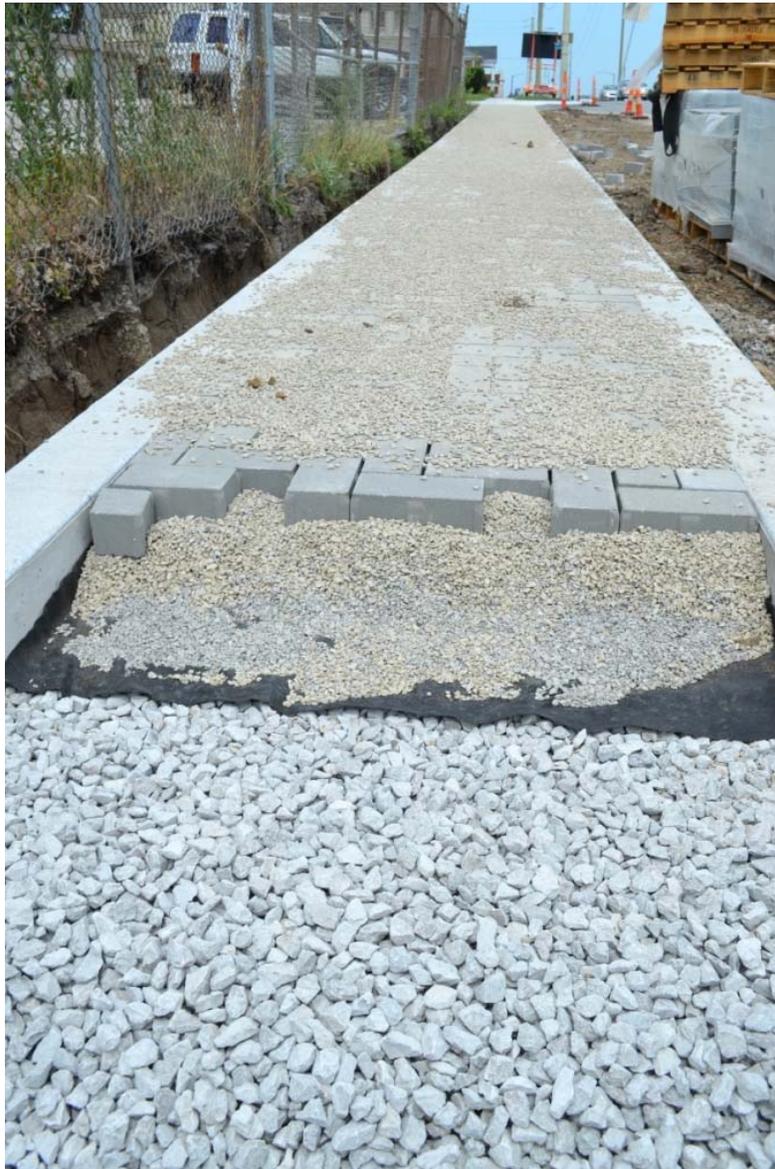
Porous pavement sidewalk installation with filter fabric placed beneath the gravel and stone layers (courtesy of URS Corporation).
